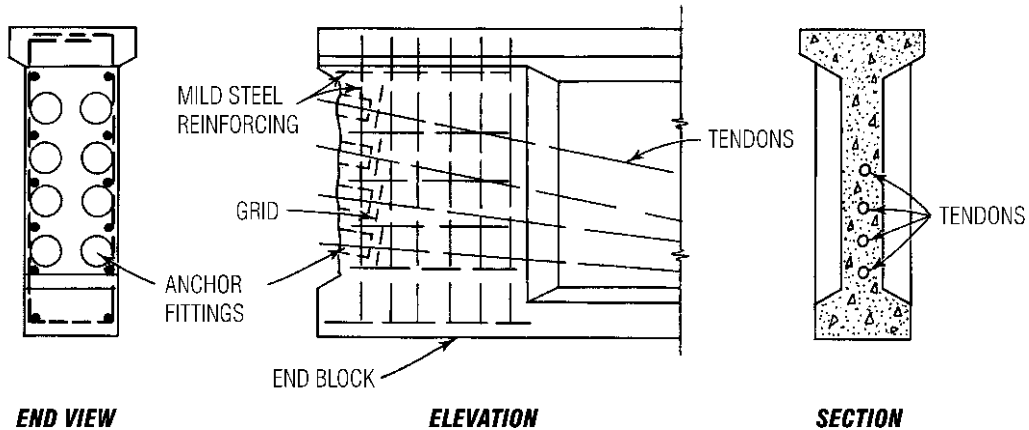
Transition from cross section of the end block of a prestressed concrete beam to the main cross section.
